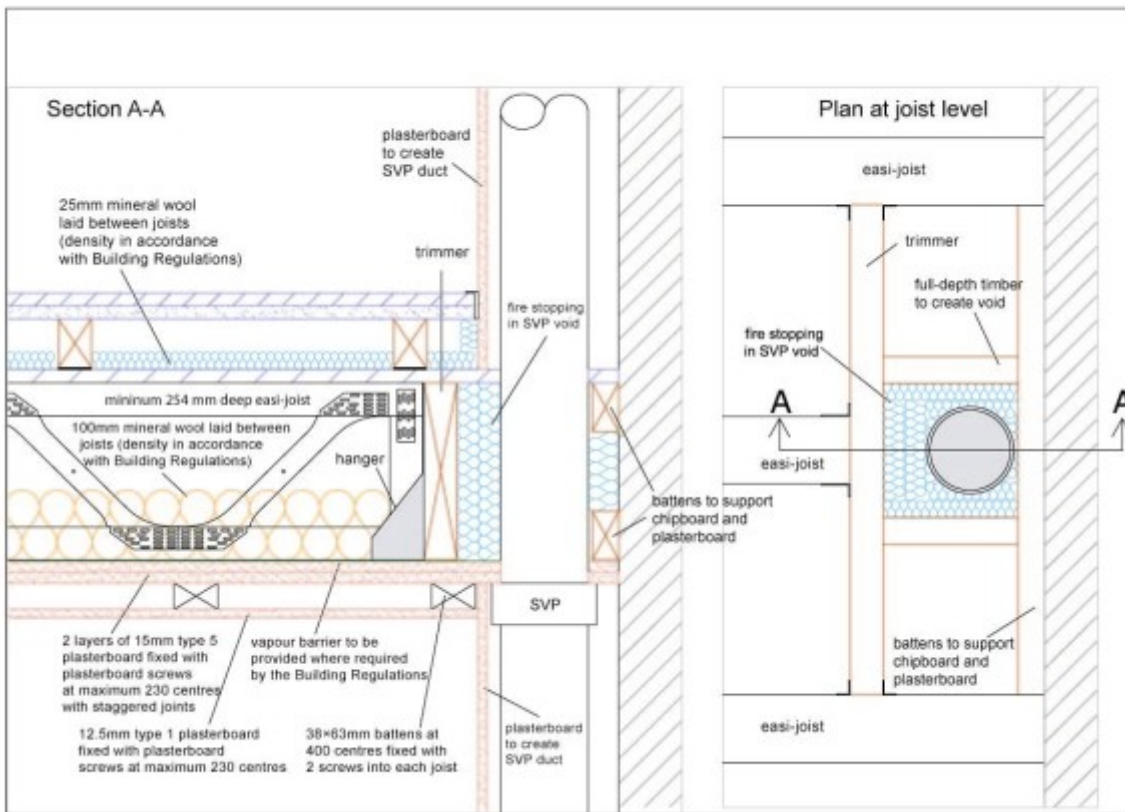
Cross section; compartment floor construction; Soil and vent pipe enclosure; 60 minutes fire resistance
